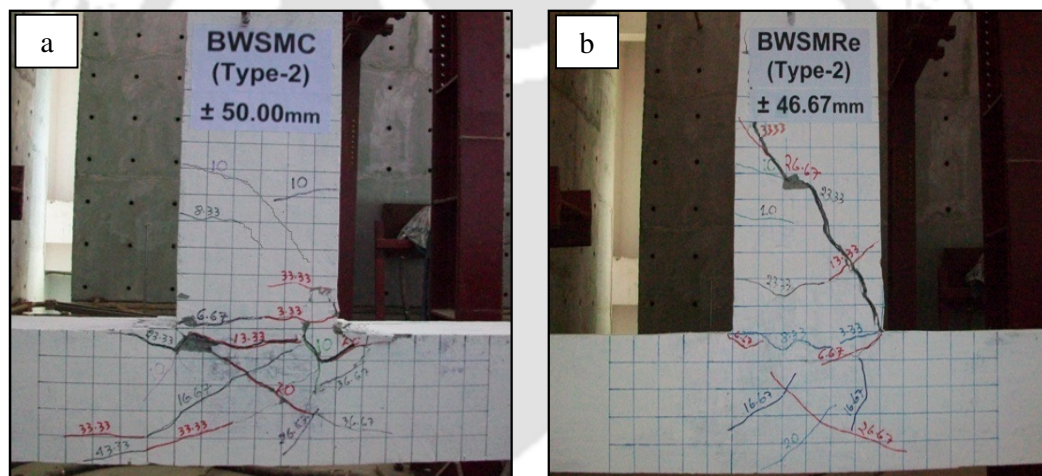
BWSM specimens at the end of test under loading type-2:
